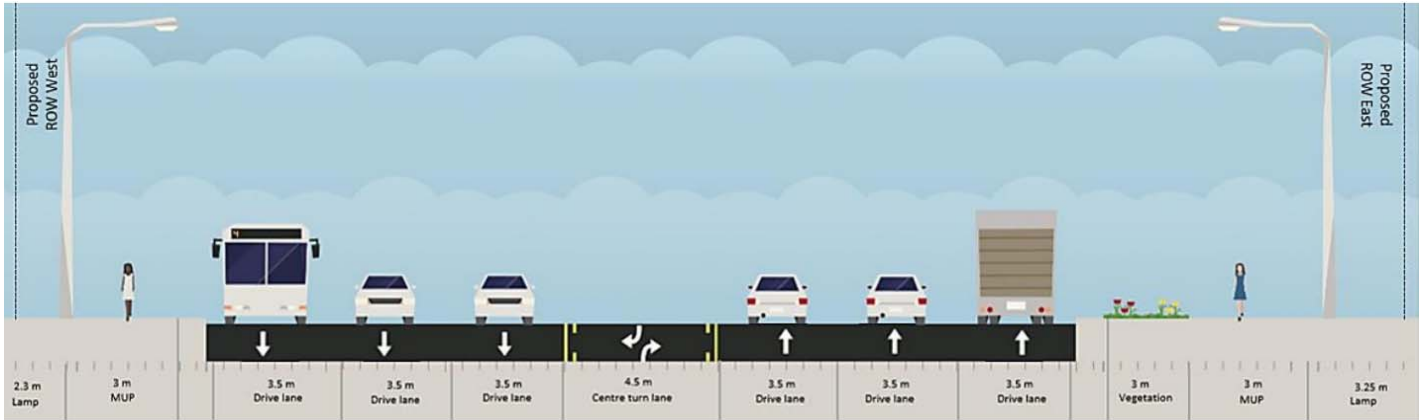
Preferred Cross Section Design for Section 2 (Steeles Ave. to Maple Lodge Farms)
